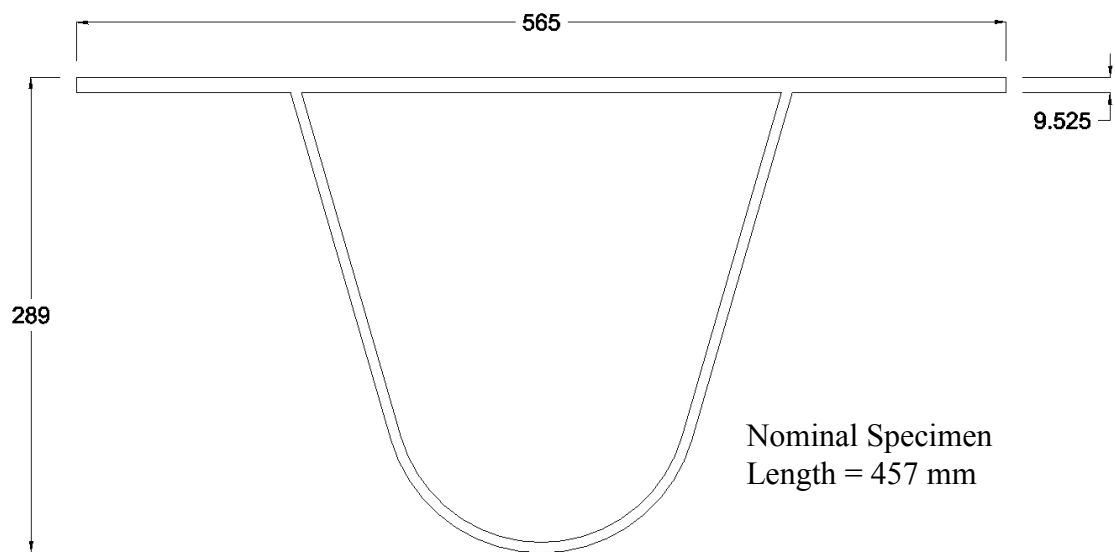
Nominal dimensions for the type A specimen (all dimensions in mm).
